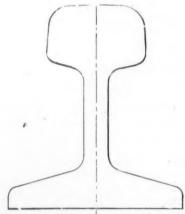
Suggested Section.—Area of Top Section, 4.75 sq. in. Bottom Section, 4.6 sq. in. Area of Whole Section, 11.3 sq. in. Weight Per Yard, 115.5
